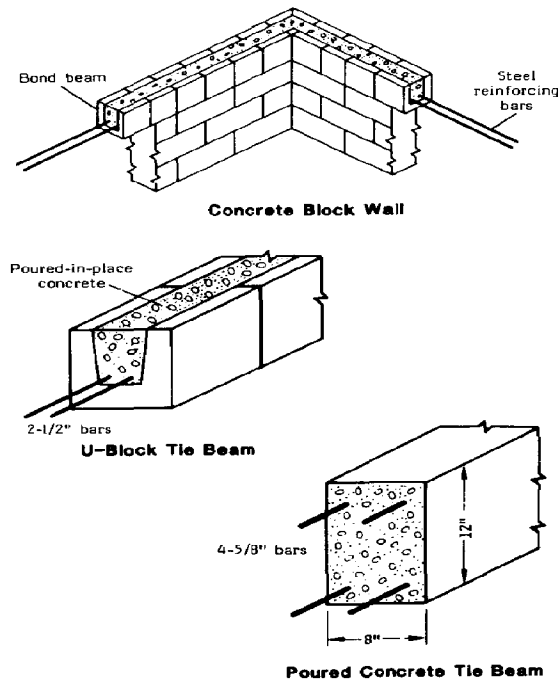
Reinforced tie beam (bond beam) for concrete block walls—to be used at each floor level around the perimeter of the exterior walls.
